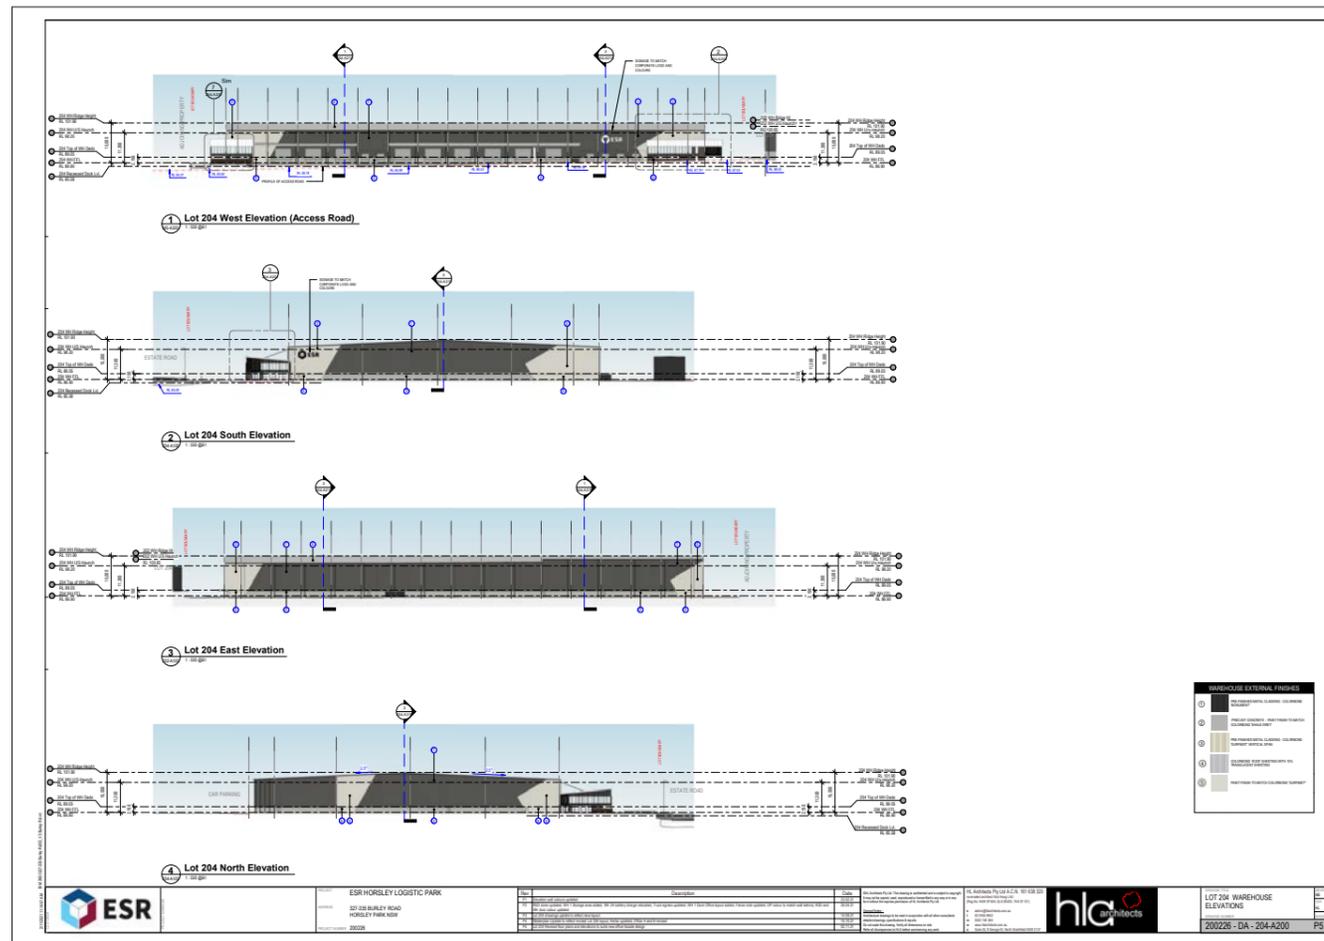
Proposed Modification 4 - LOT 204 Warehouse Elevations (Source: HLA)
